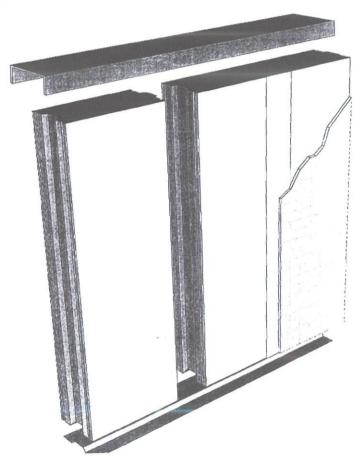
UCO Bhd's UAC concrete solid wall panel used in project.
